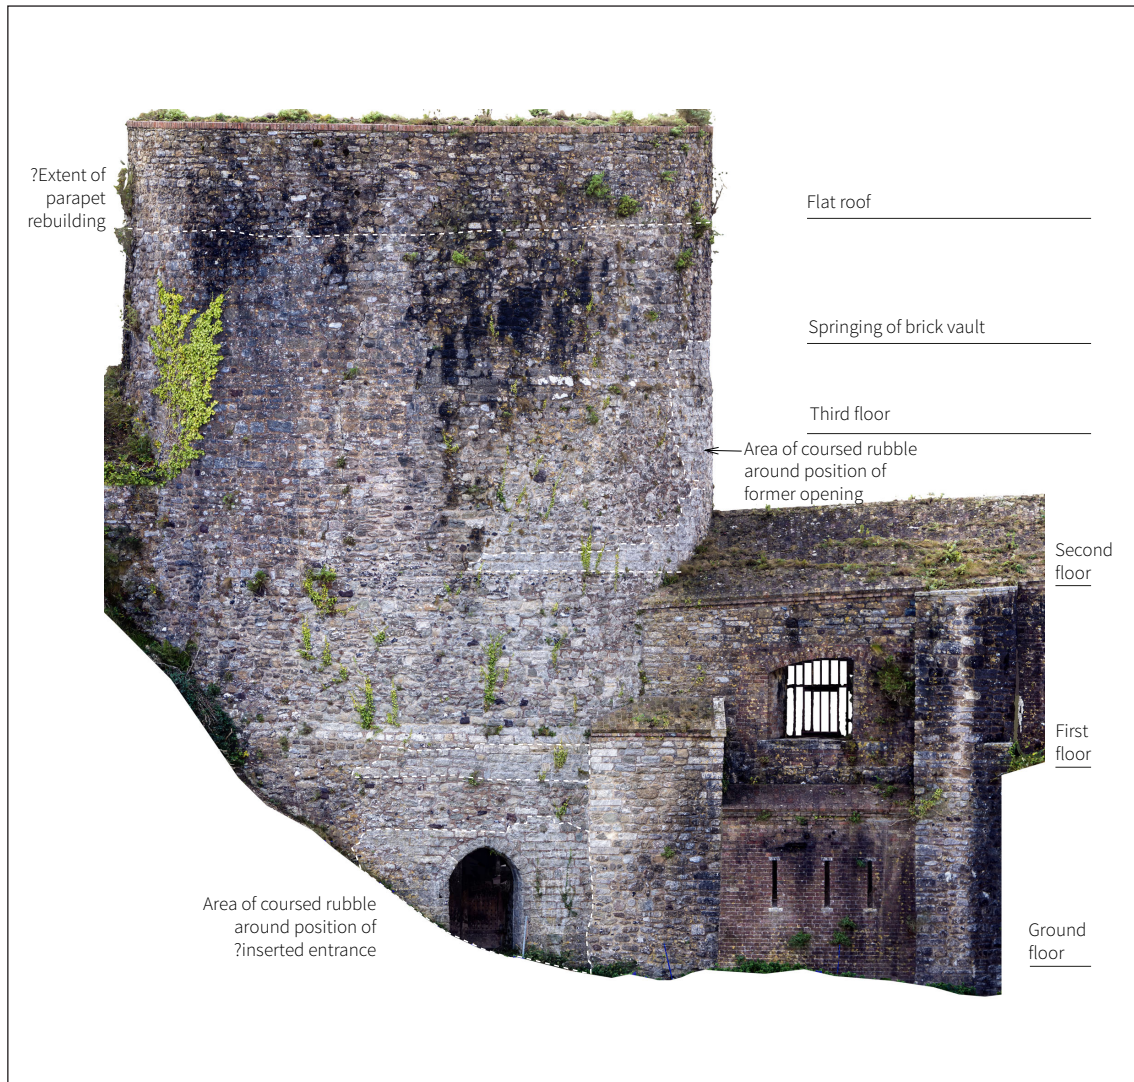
East elevation, St John's Tower (Photogrammetry courtesy of English Heritage)
